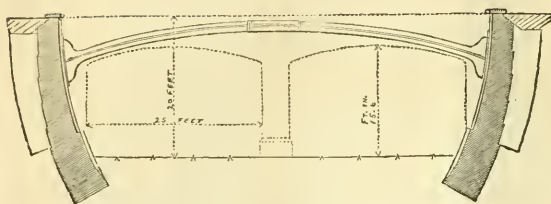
Transverse section of the Euston Incline retaining walls, &c.
